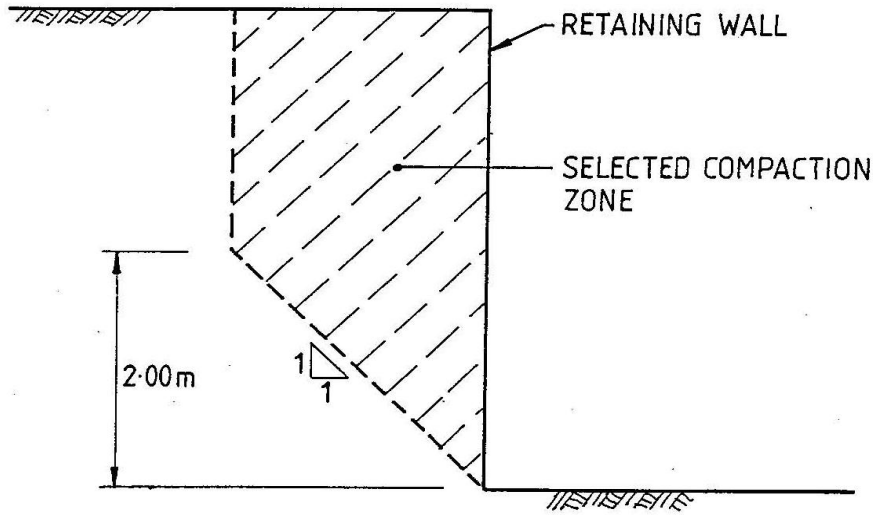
ZONE REQUIRING SELECTED COMPACTION BEHIND A RETAINING WALL.
